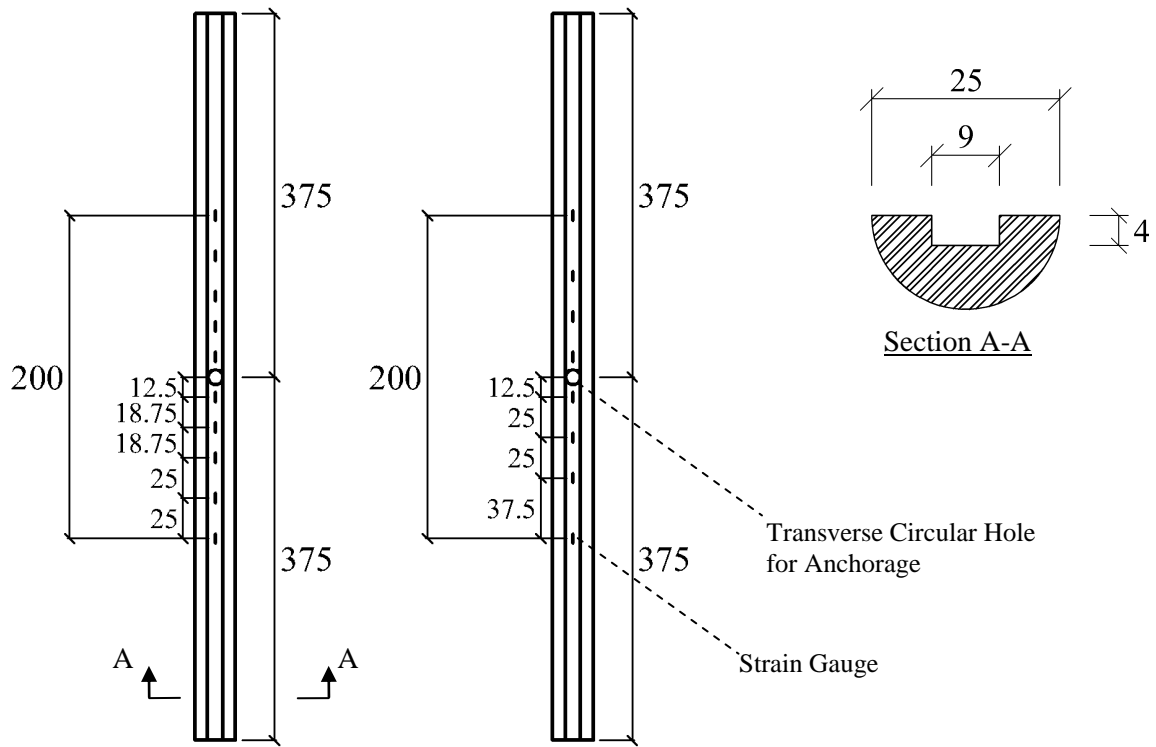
Details of machined bar and positions of electrical resistance strain gauges for Kankam tests (dimensions in *mm*)
